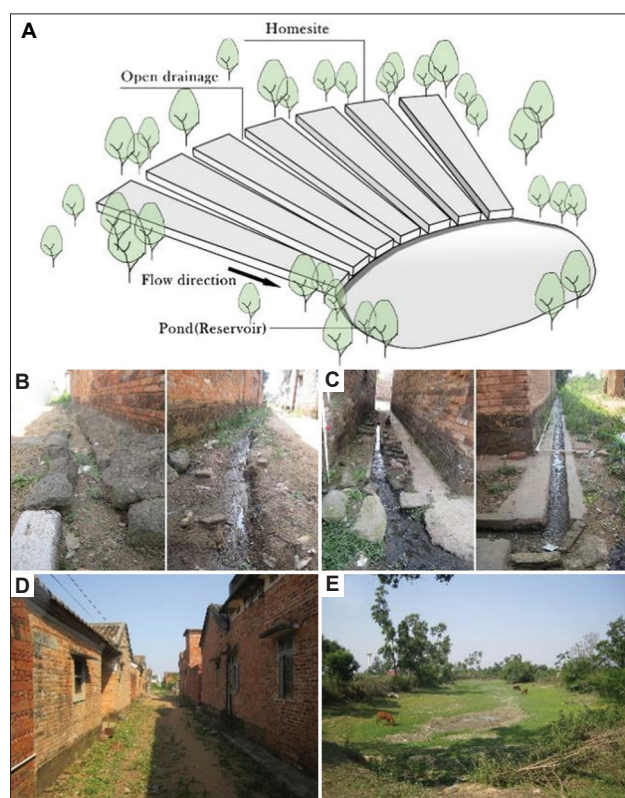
Storage–drainage system in the cohesive village (Xinpozai Village, Kelu Town). (A) Schematic diagram of storage and drainage system in cohesive village. (B) Water storage ditch of the main lane. (C) Residential water storage ditch. (D) Main lane. (E) Water pond in front of the village during the dry season. Source: Drawing and photos by the author
